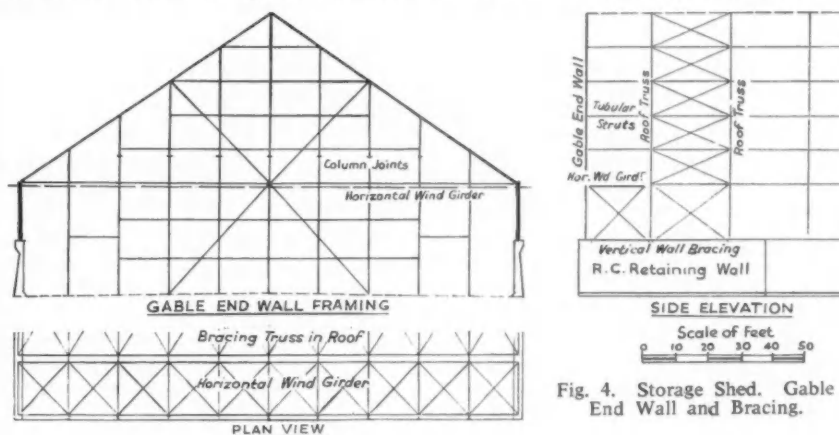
Storage Shed. Gable End Wall and Bracing.
